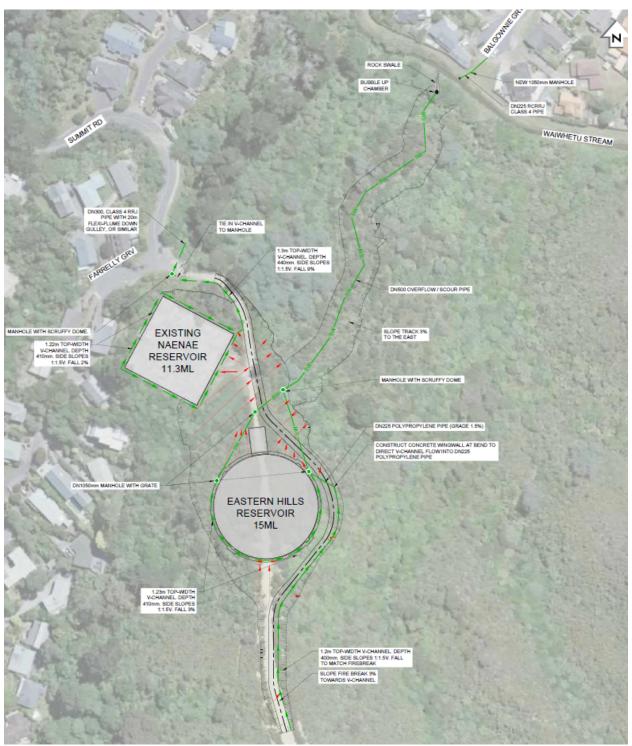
Proposed stormwater system design showing stormwater flow (green arrows)
